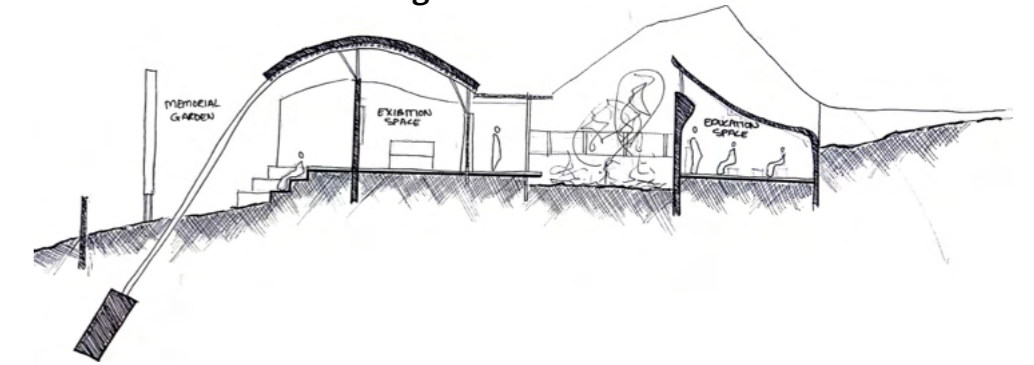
Design Approach 3 Sectional Roof Development (Author, 2021)
